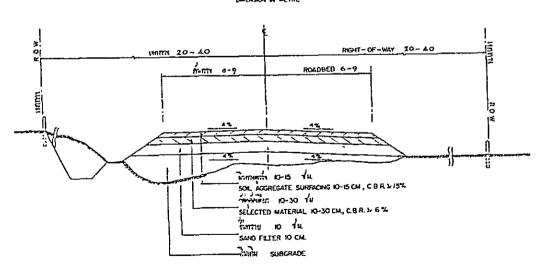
Typical Pavement Structure for Feeder Roads or Provincial Roads (Rural)
